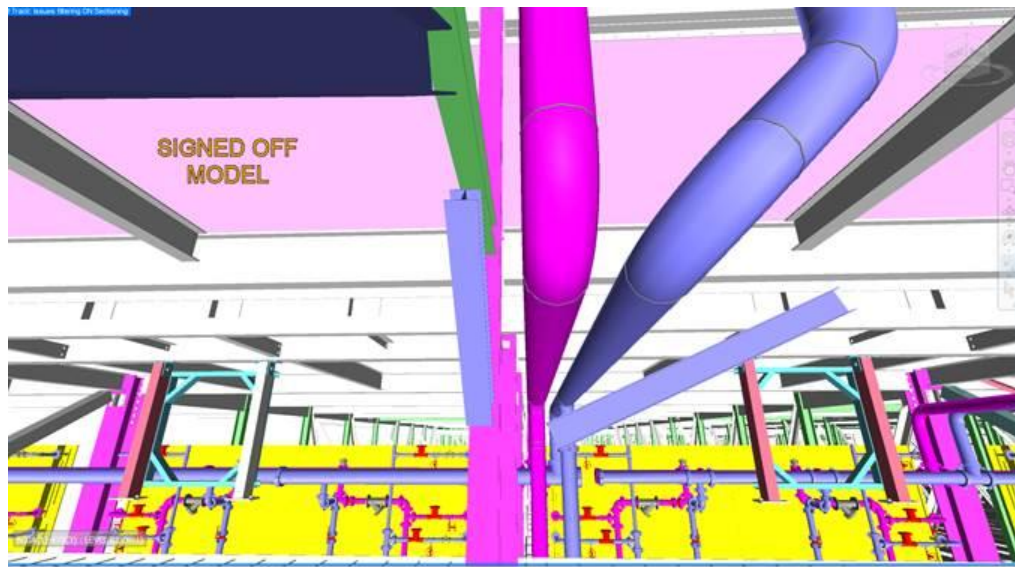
A structural model without connection details and not clashing with the plumbing pipe.
